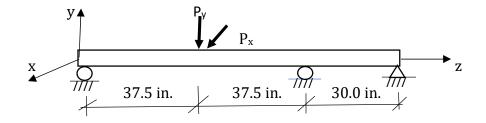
12 in. x 12 in. x 1/2 in. Three Span I beam. Point Load Center Span
